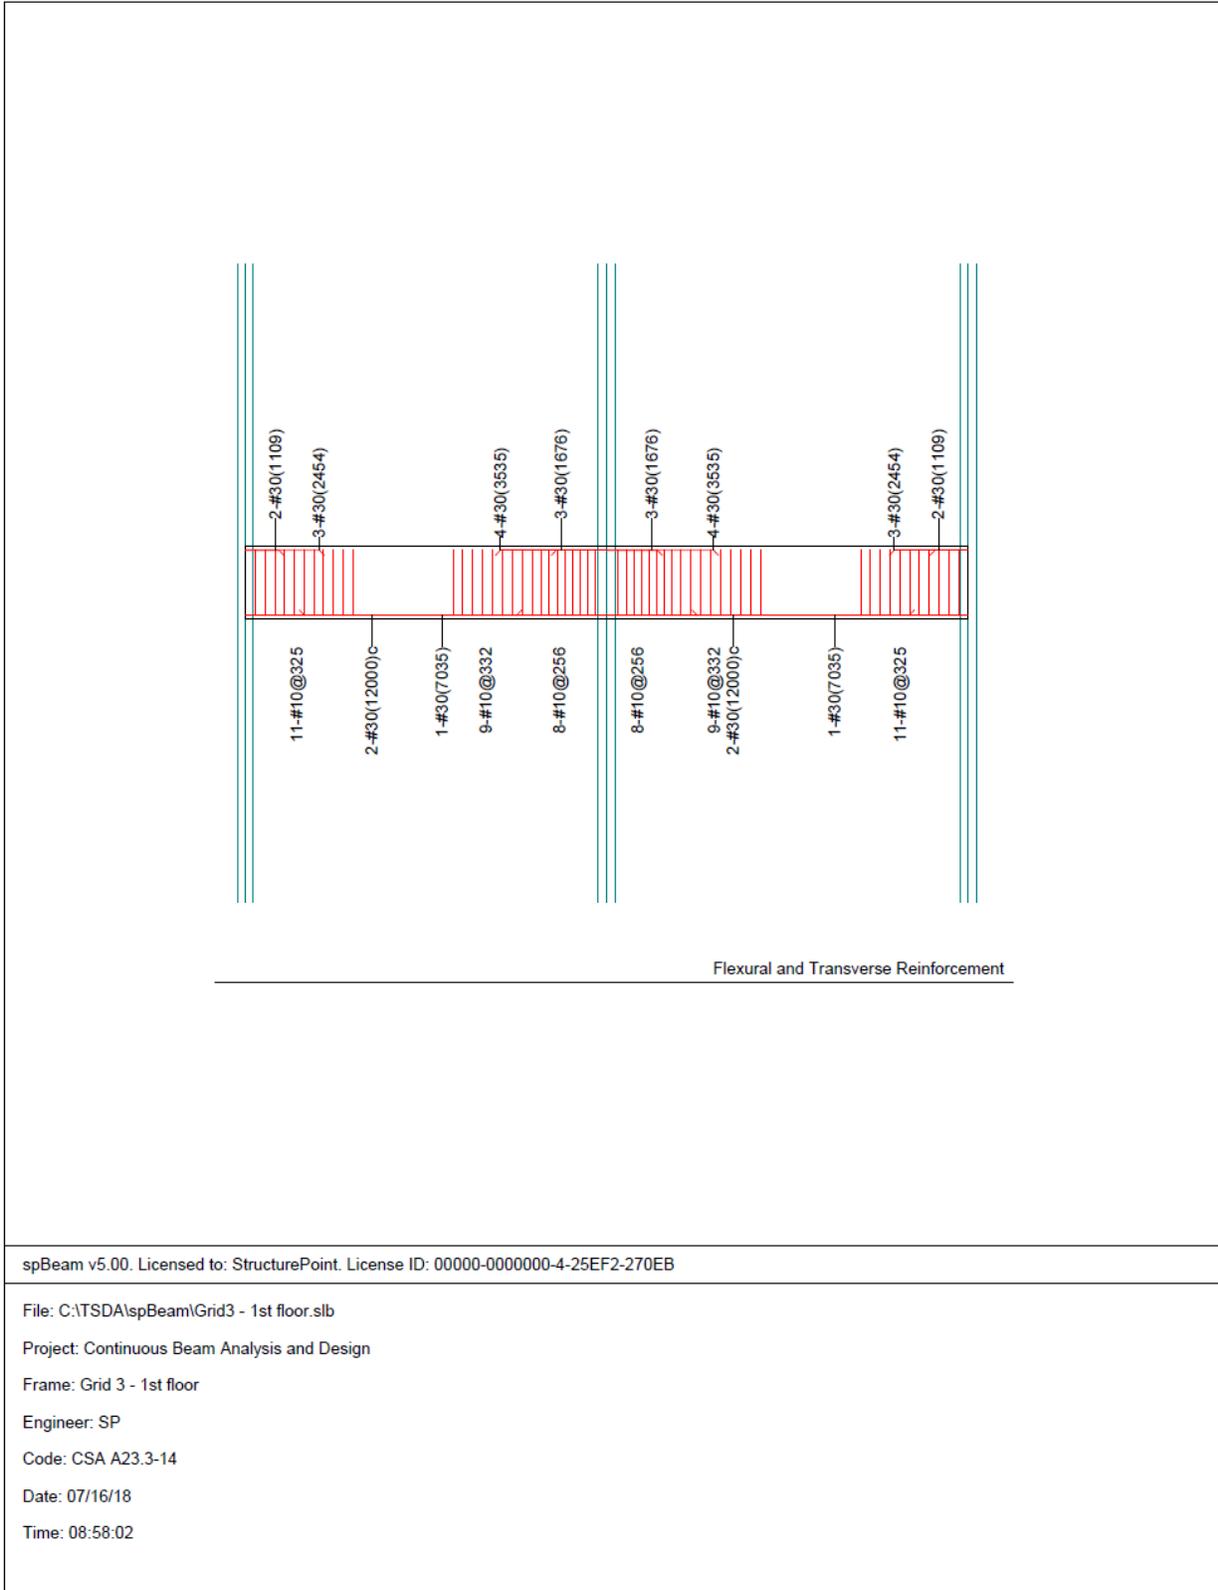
Longitudinal and Lateral Reinforcement (spBeam)
